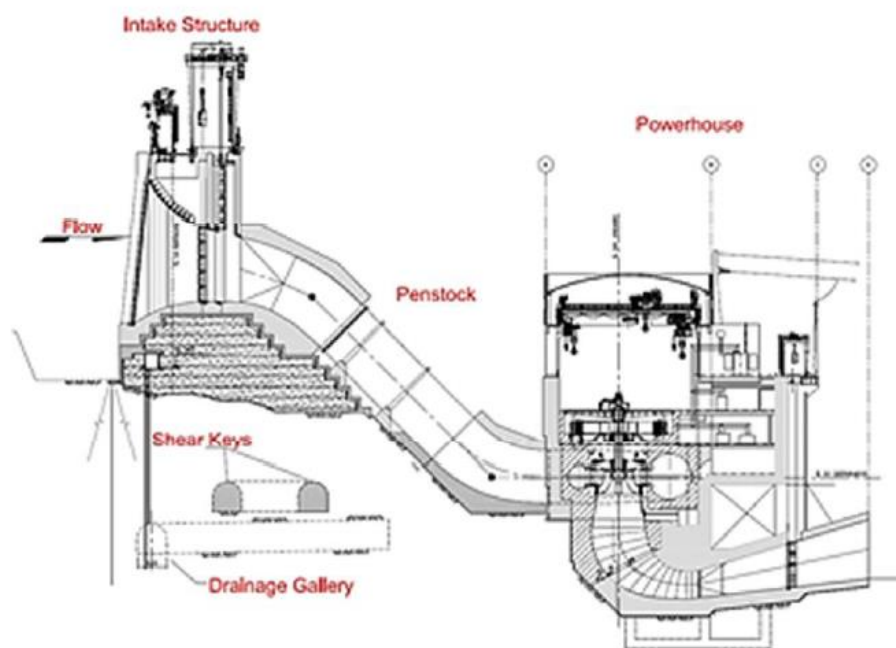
Cross section of intake structure foundation shear keys, drainage galleries and drainage curtain
